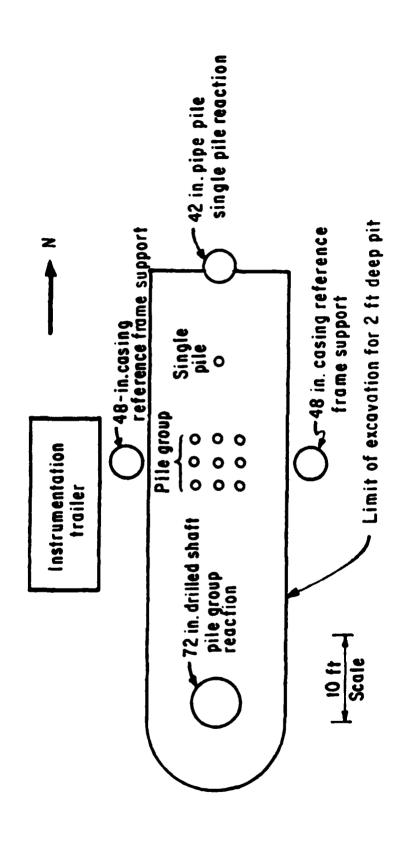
Site plan (after Brown and Reese, 1985).
